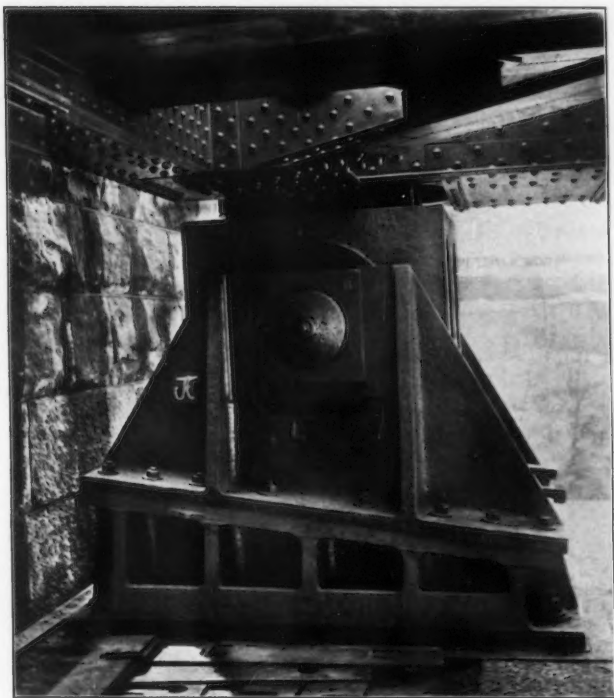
ANCHORAGE DETAILS, BRIDGE AT BEAVER, PA.
